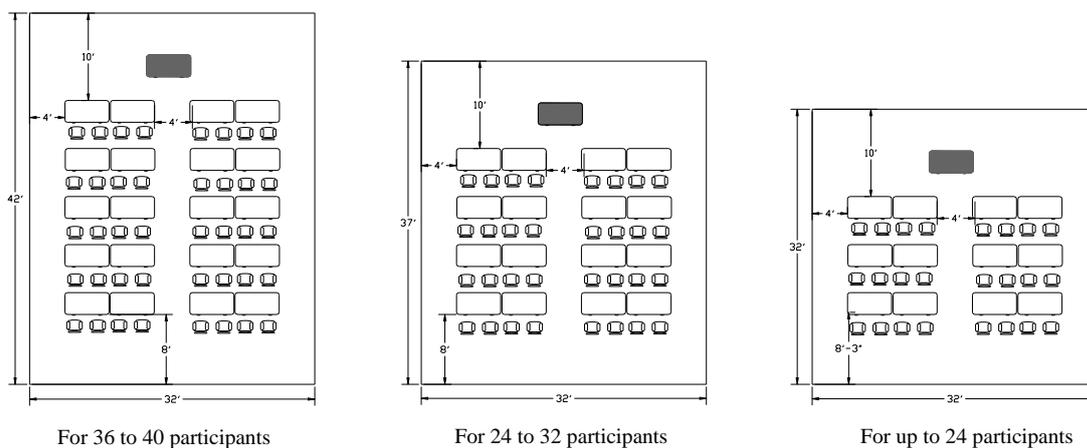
CLASS ROOM SITTING ARRANGEMENT
